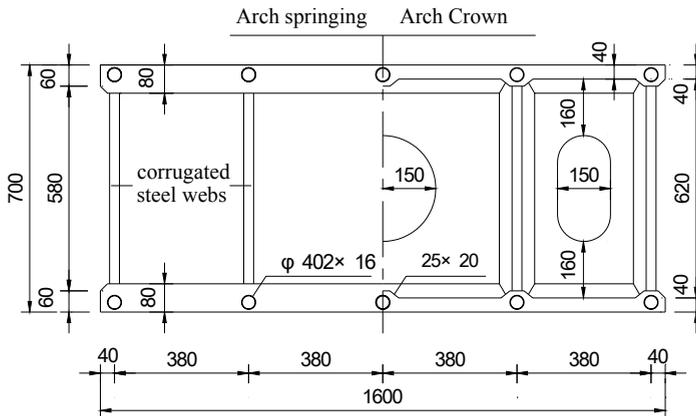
Arch cross section of the trial designed bridge (unit: cm)
